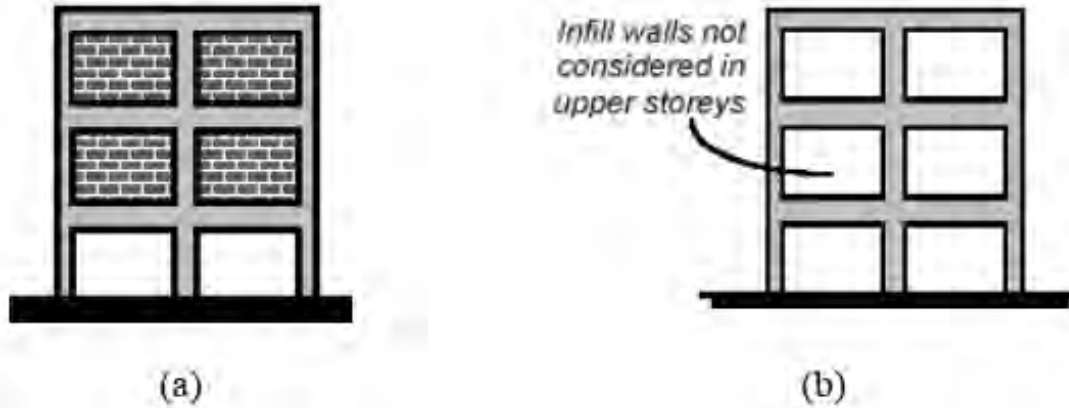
Buildings with open ground story (a) actual building (b) building being assumed in current design practice (Zerin, 2018).
